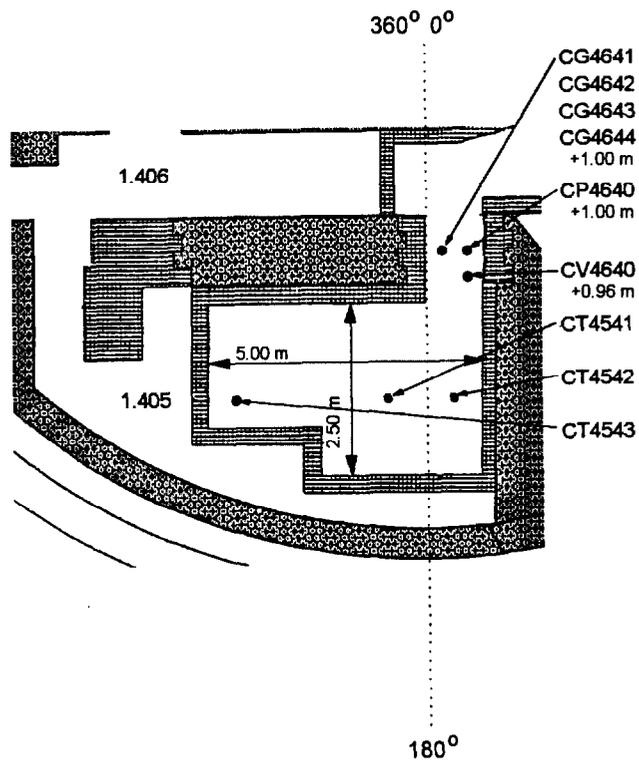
Fire Room at the +1.7 m Elevation for T51.1
